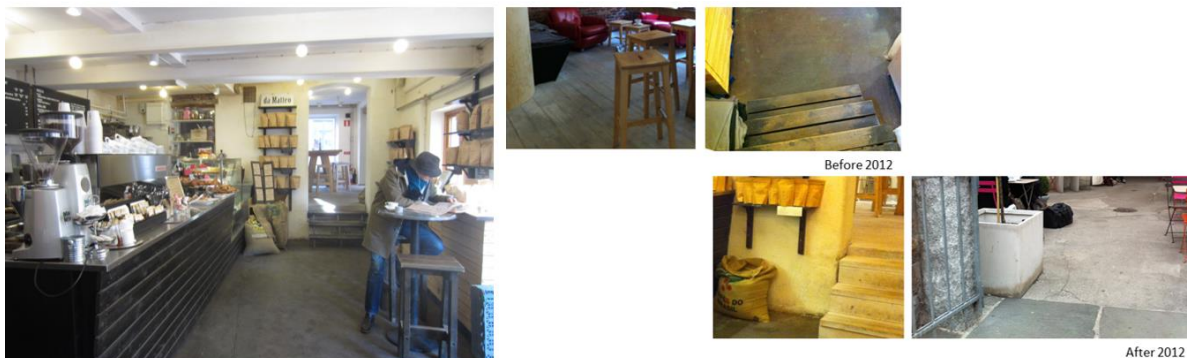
Reception bar area: the wooden floor and steps were replaced with concrete in 2012.
